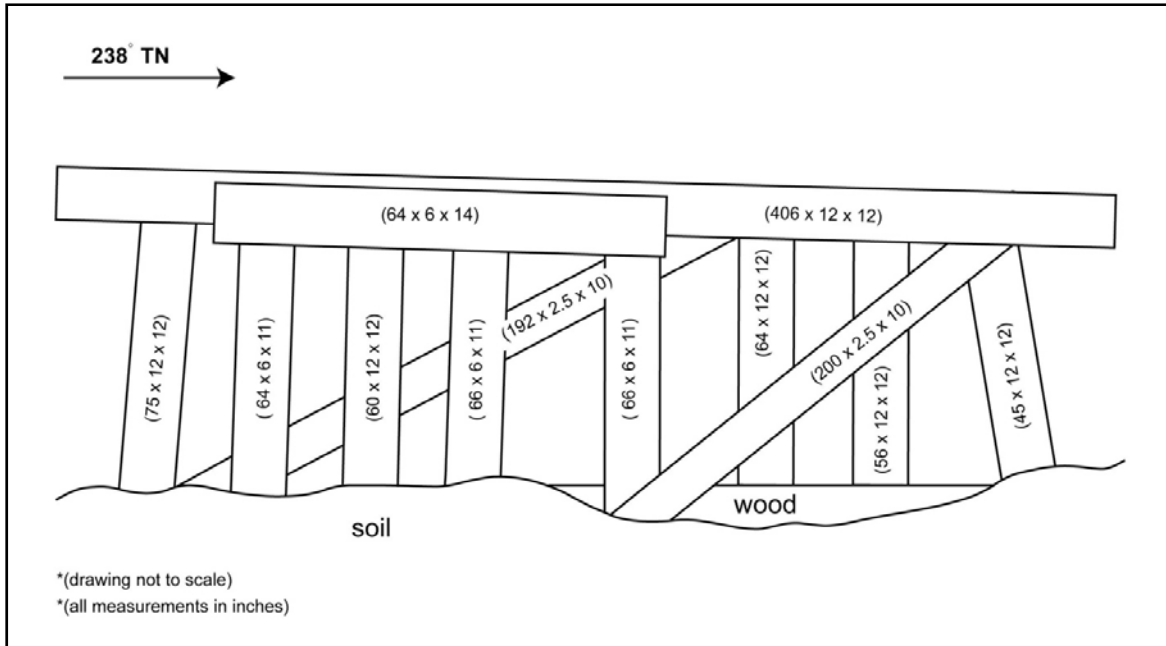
Schematic profile of SIHP # 50-80-07-6822 (Bridge 3), showing wooden bridge columns and bents with dimensions; plank X-bracing is not depicted but plank dimensions are shown
